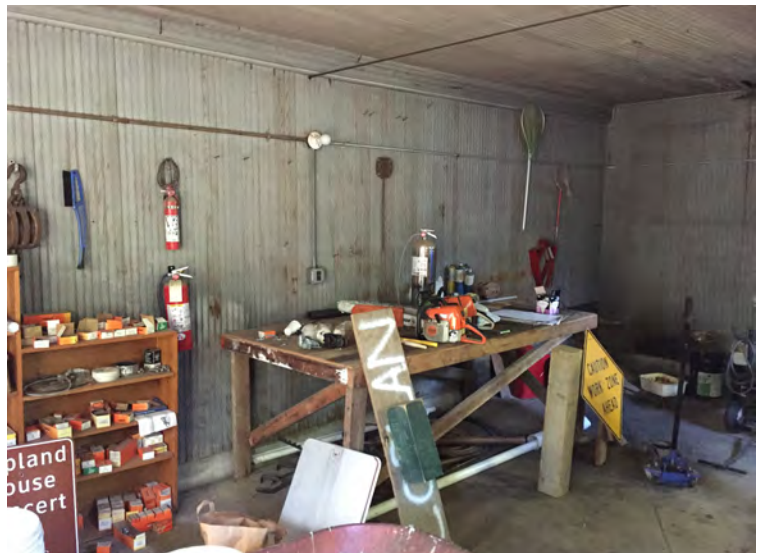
Wall mounted porcelain light sockets with exposed conduit in garage area. (HA, 2015)
